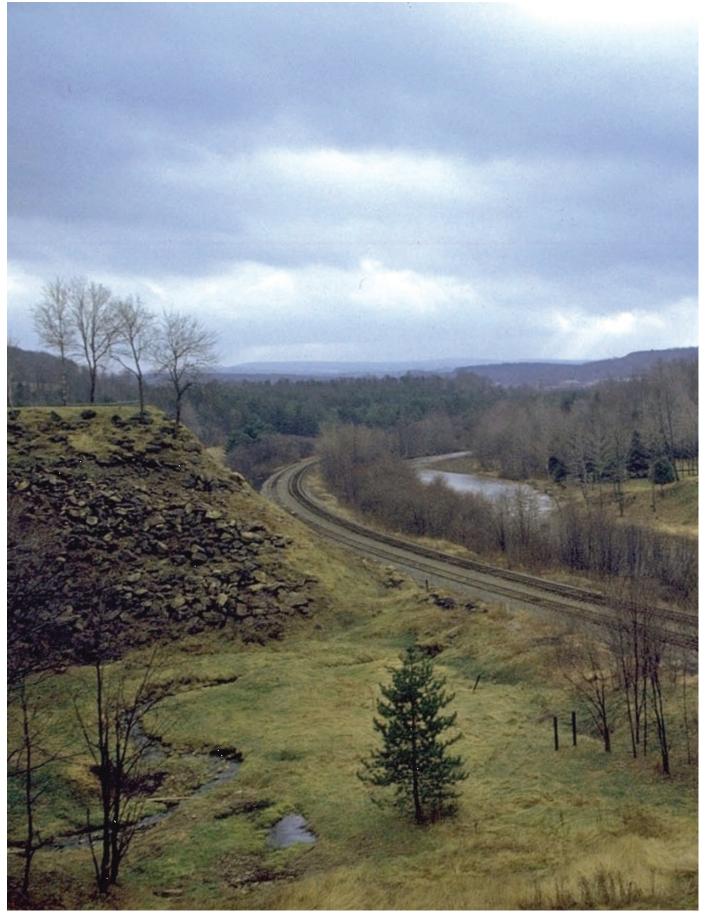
Current photograph of South Fork Dam depicting abutment remnants (National Park Service, 2008).
